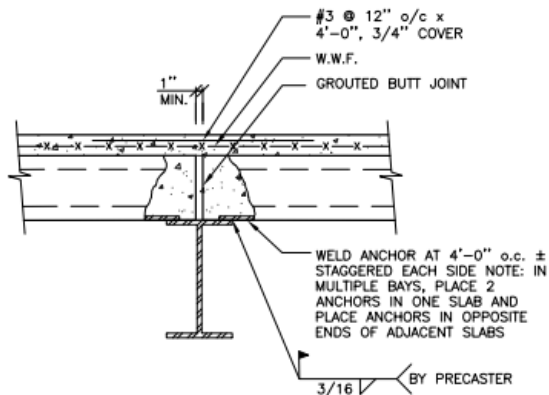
Precast Plank Bearing on Steel Beam (S12.20 Drawing 11)
